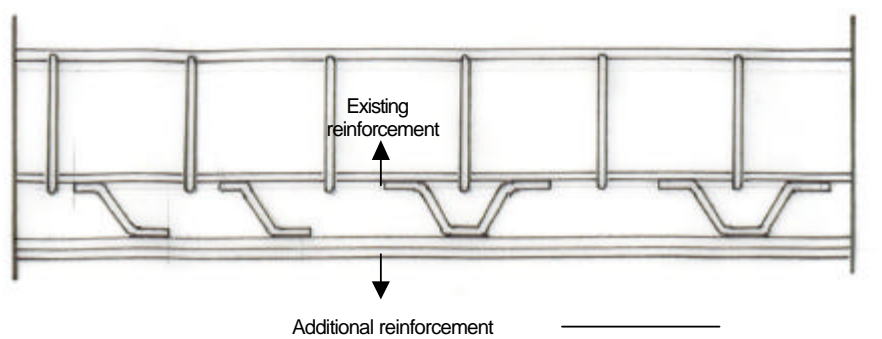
Connection of existing and new reinforcements by means of V and Z reinforcing bars [46]
